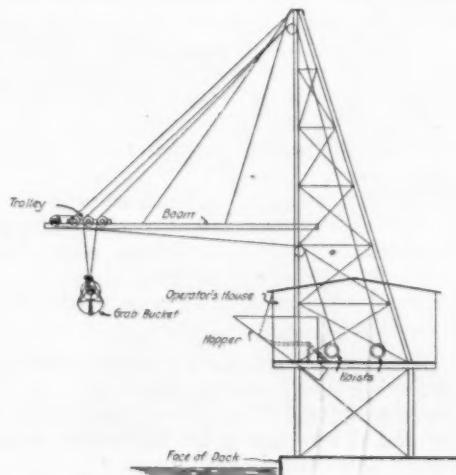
STEEPLE TOWER FOR UNLOADING BOATS
